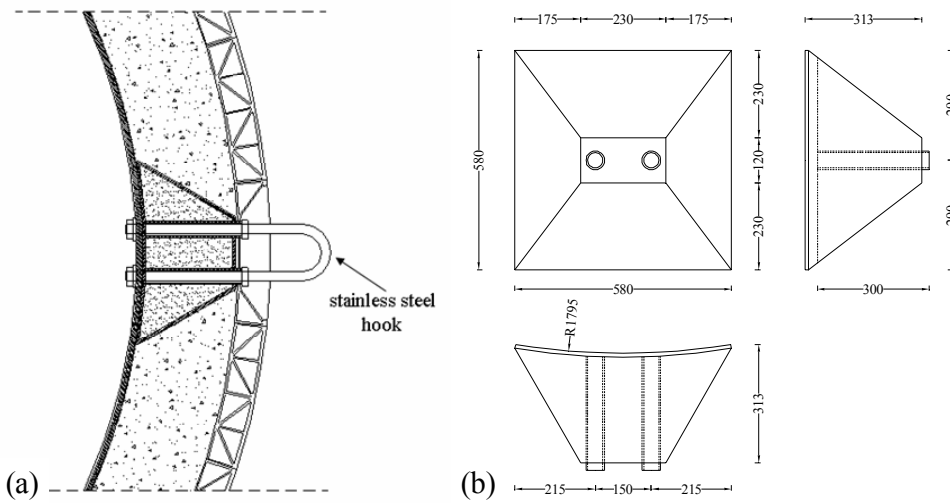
Anchoring connection detail: (a) section; (b) details of the “pyramidal” reinforcing box (dimensions in mm).
